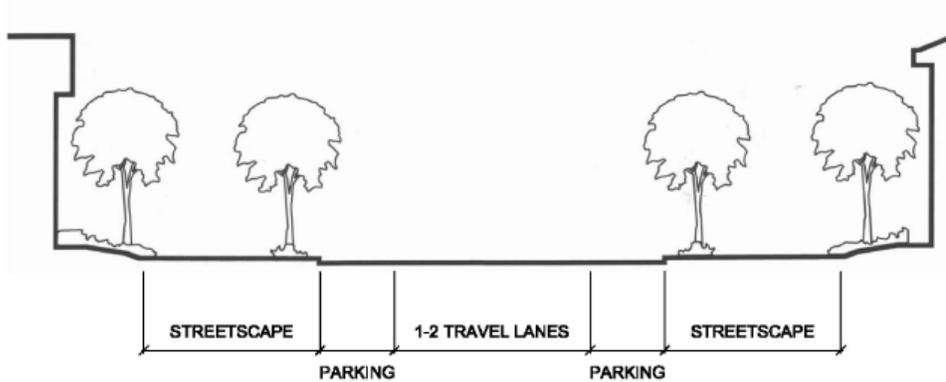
A typical residential roadway (32-foot-wide) cross section
